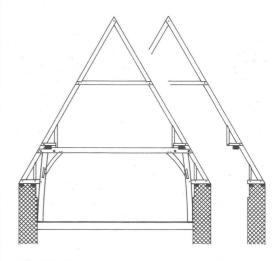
Roof construction with trusses in Leeuwenberg House, Oude Gracht 307 Utrecht, 1319–1325 (d). (Drawing L.M. de Klein RDMZ)
